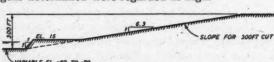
Typical Slope Based on Slope Curve in Fig. 64
